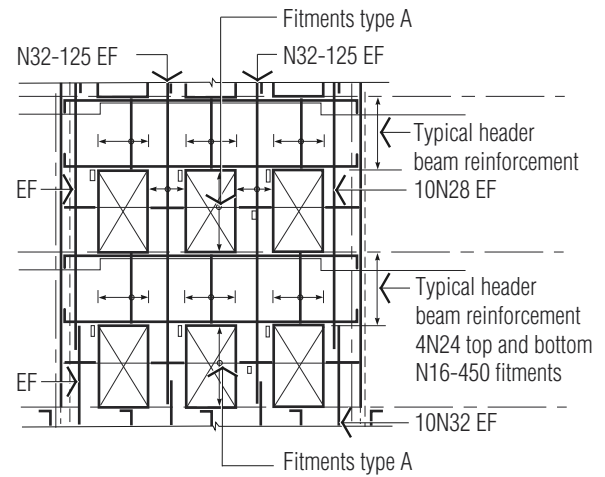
This figure shows an elevation of a lift shaft with reinforcement on both faces including the header beam details, etc.
